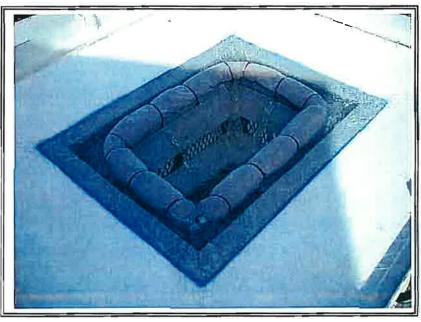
Blue RTV Silicon placed around edge of Skimmer Box
